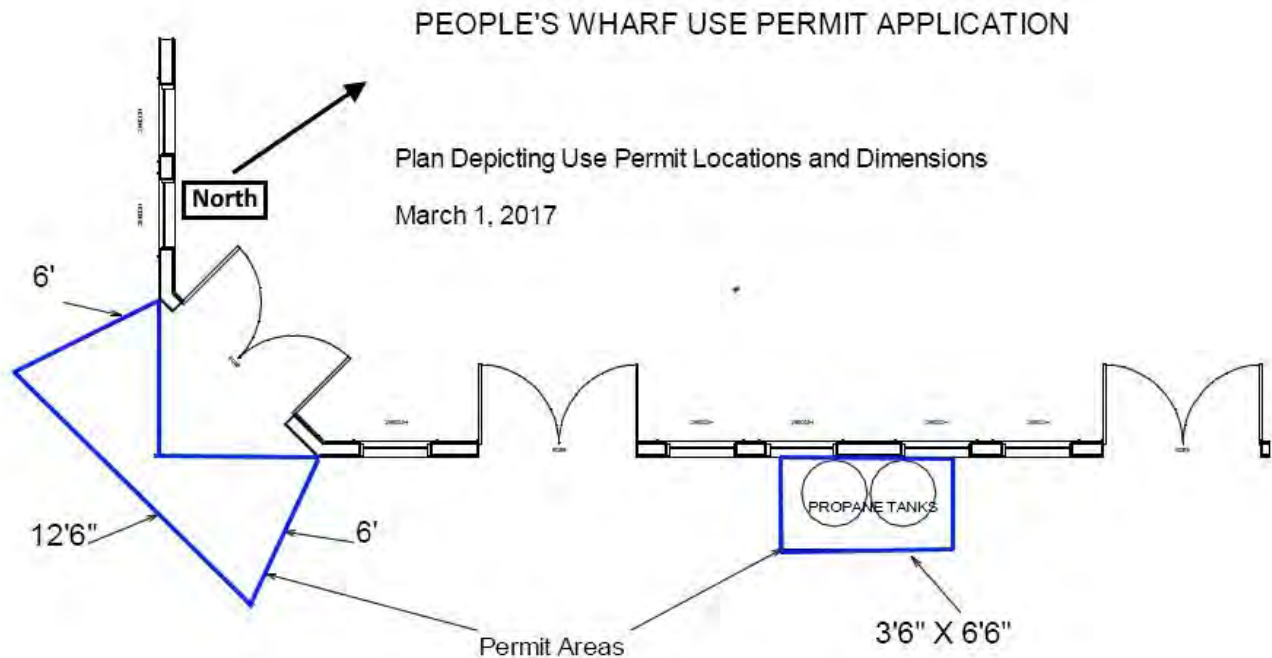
SHOWING SUBJECT PERMIT AREAS ADJACENT TO PEOPLE’S WHARF BUILDING SITE.
